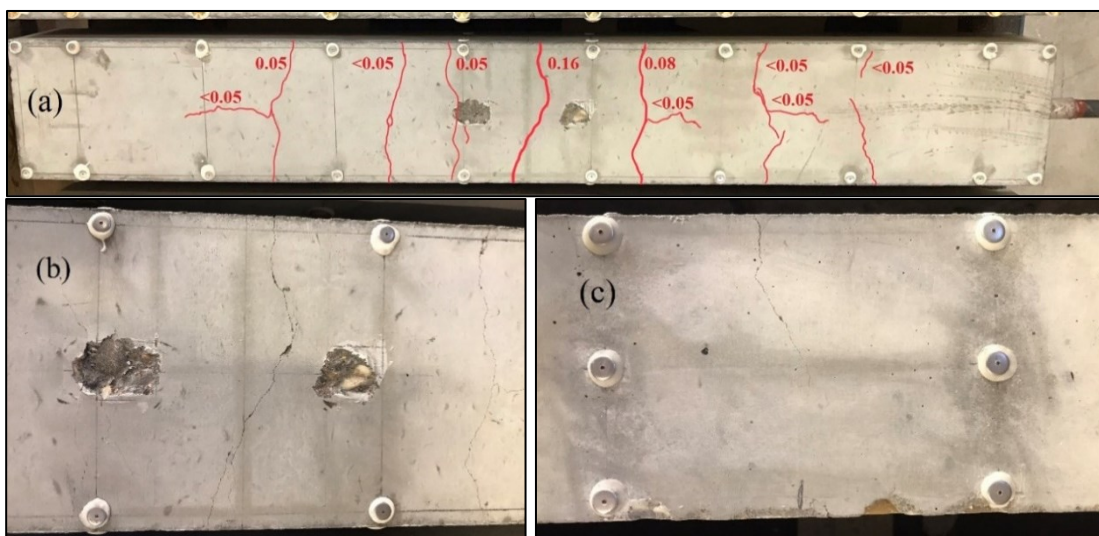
C1 cracks configuration: (a) Mapping, (b) Main crack top view, (c) Main crack lateral view
